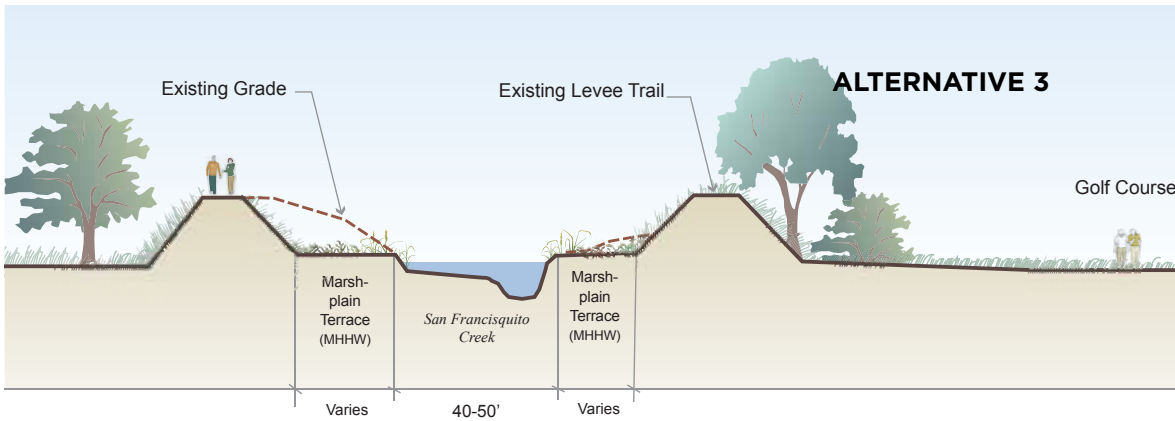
| CROSS SECTION C, VIEW LOOKING DOWNTREAM
